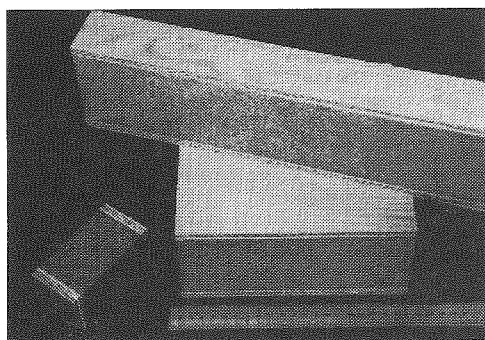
Samples of plywood-faced sandwich (PSW-T100) panel
